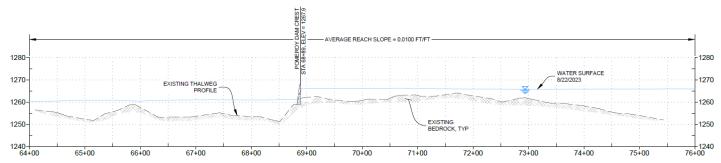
Longitudinal profile through the dam area under existing conditions. Profile and the associated plan view provided in Design Drawings in Appendix A.
